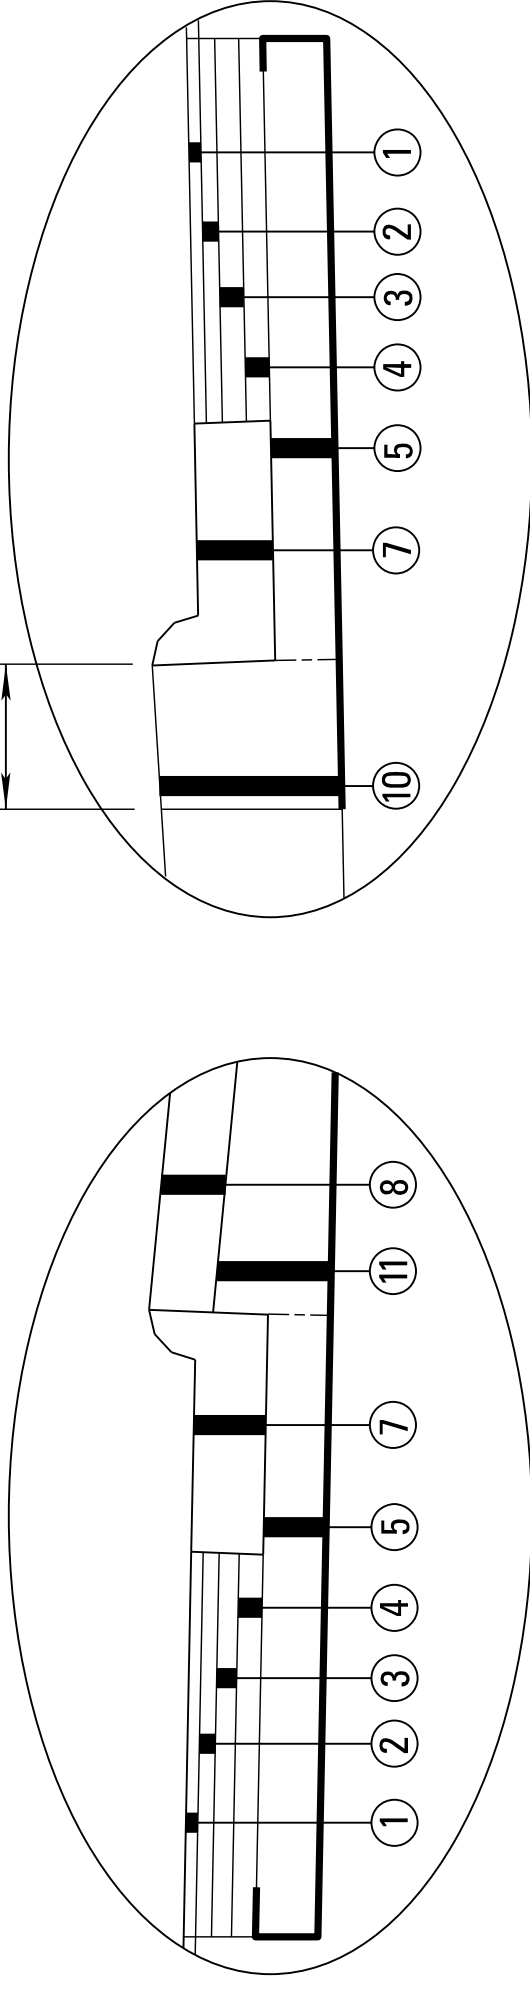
A MODIFIED CURB AND GUTTER
